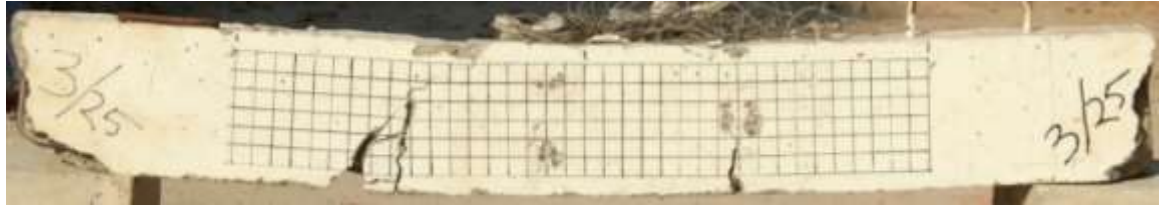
13: Failure Mode for beam SSM- 1 due to concrete crushing
